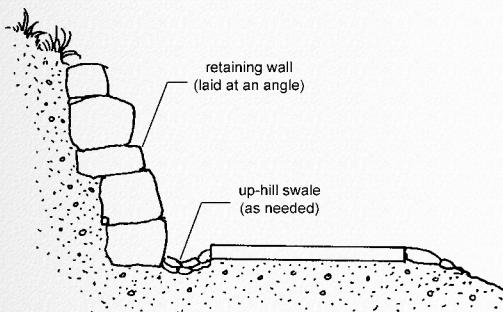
Retaining walls prevent debris from building up on the trail surface and stabilize the width of the trail.
